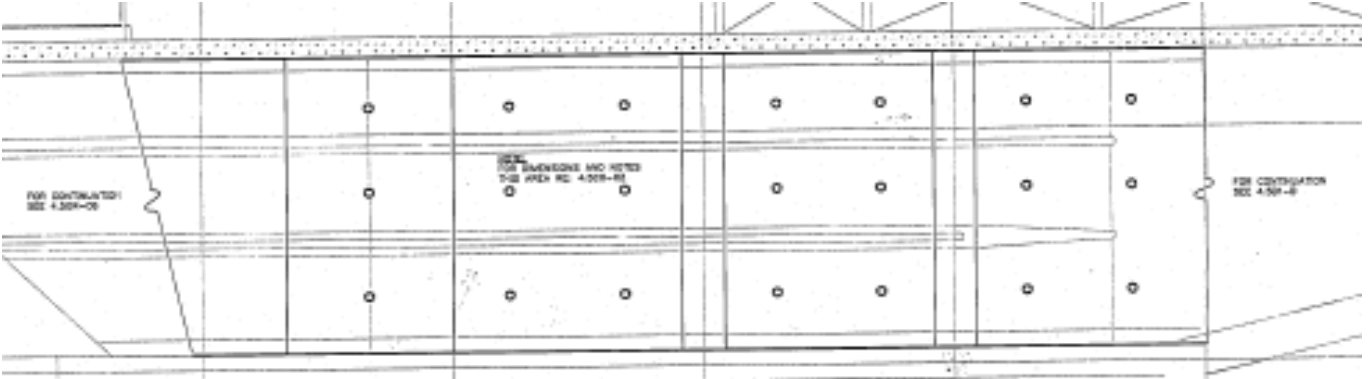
14<sup>th</sup> Street South Ramp Reflected Ceiling Plan – B1 Level
